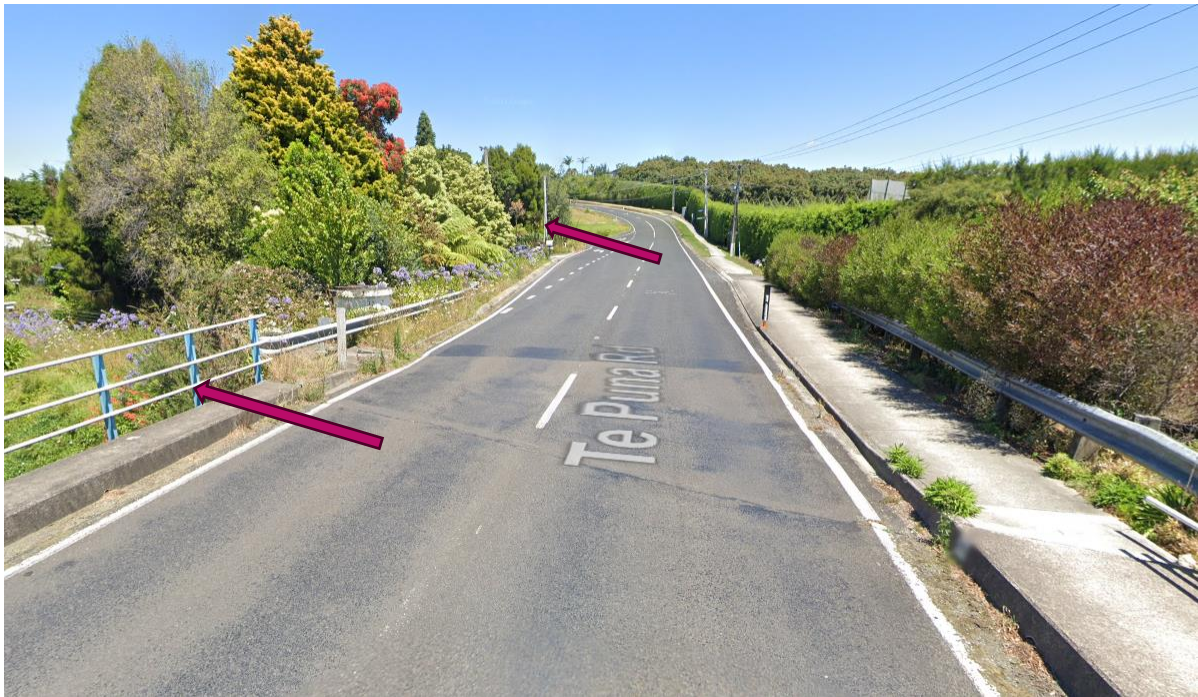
LOOKING DOWN TE PUNA ROAD TOWARDS THE INTERSECTION WITH TE PUNA STATION ROAD
